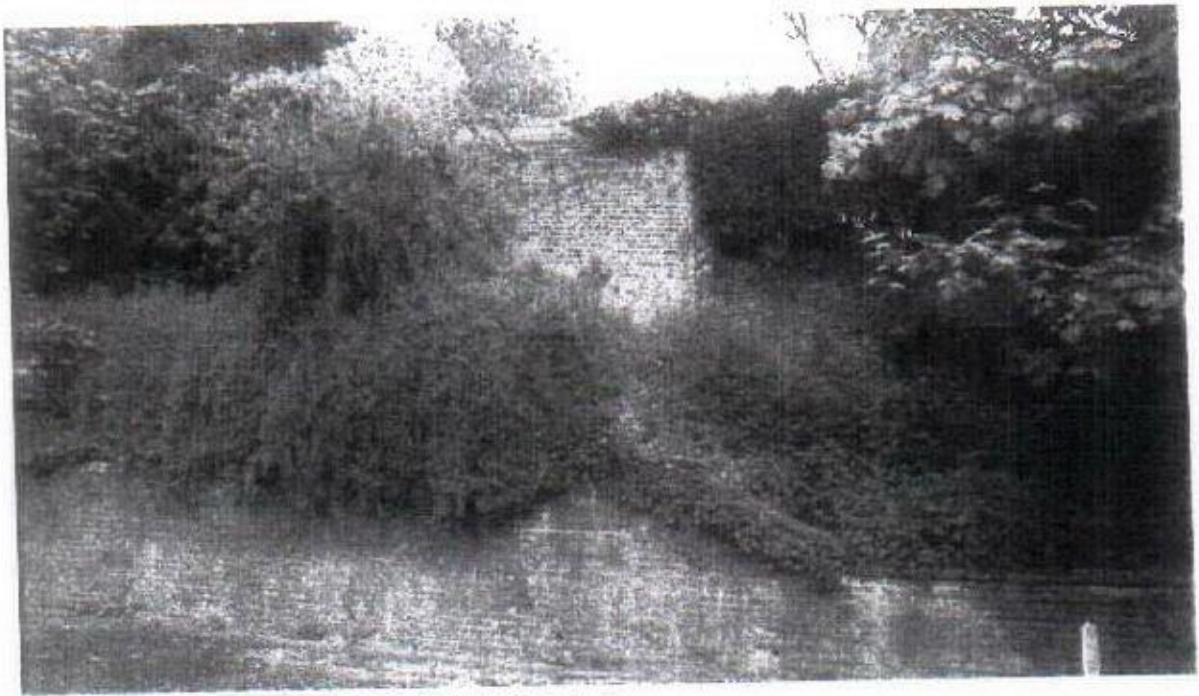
BOUNDARY WALLS 6,7 & 8
